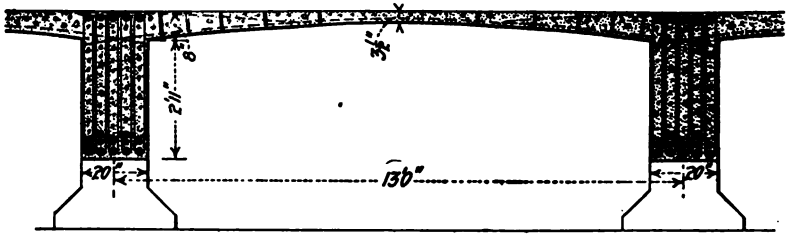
Arch Slab Floor Carried by Arch Ribs.
